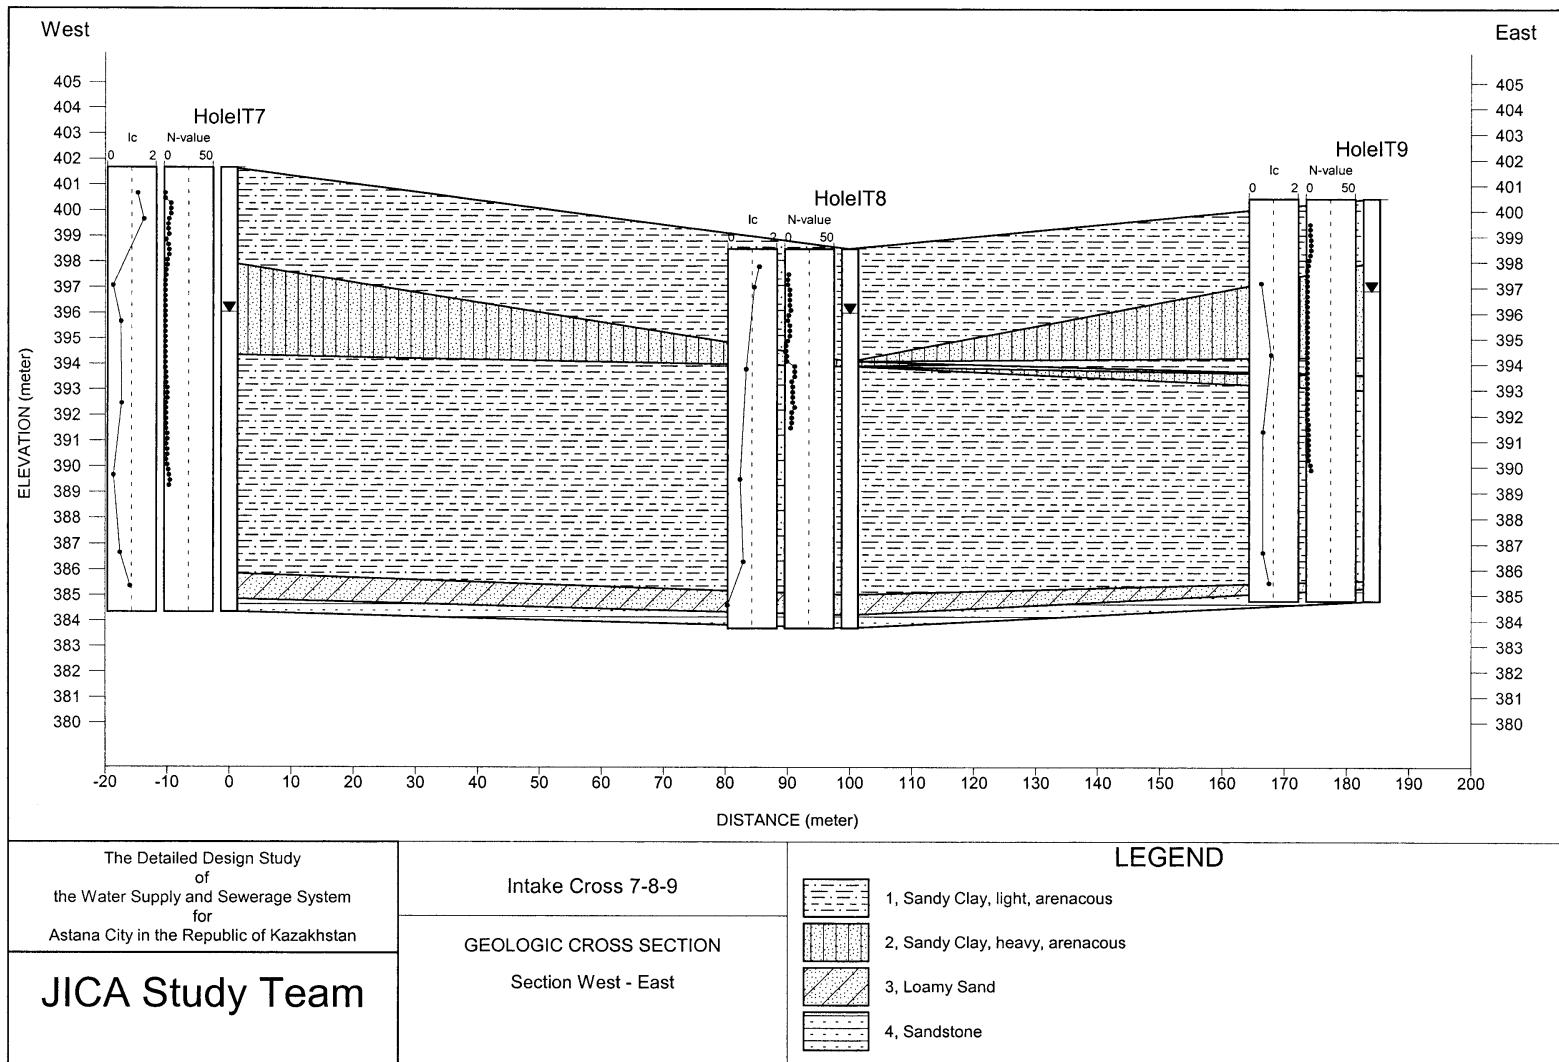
(3) Geological Cross Section at Water Intake Tower (3/3, Line No. 7-8-9)
